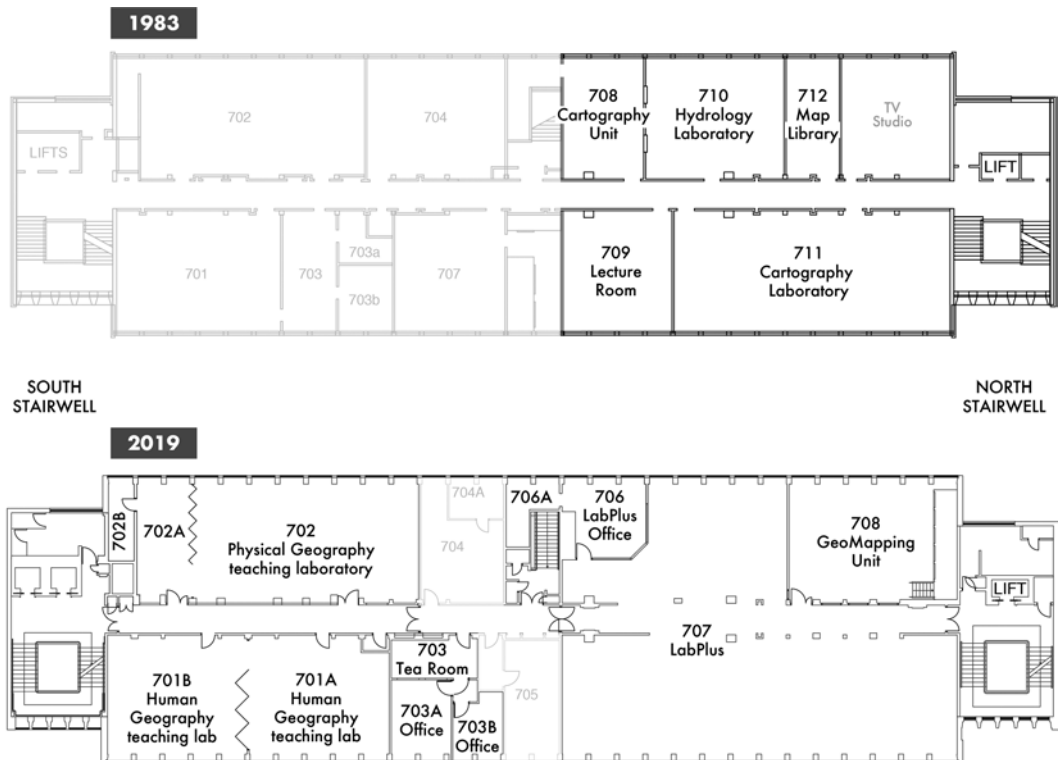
The layout of Geography's space on the 7th floor of the Davy Building, 1983 and 2019
